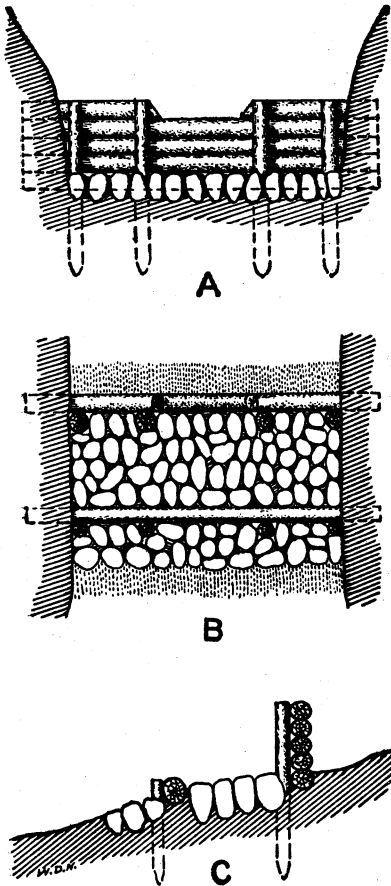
Dam built of logs and posts with spillway at center and stone pavement below the dam: A, Front view; B, top view; C, side view
